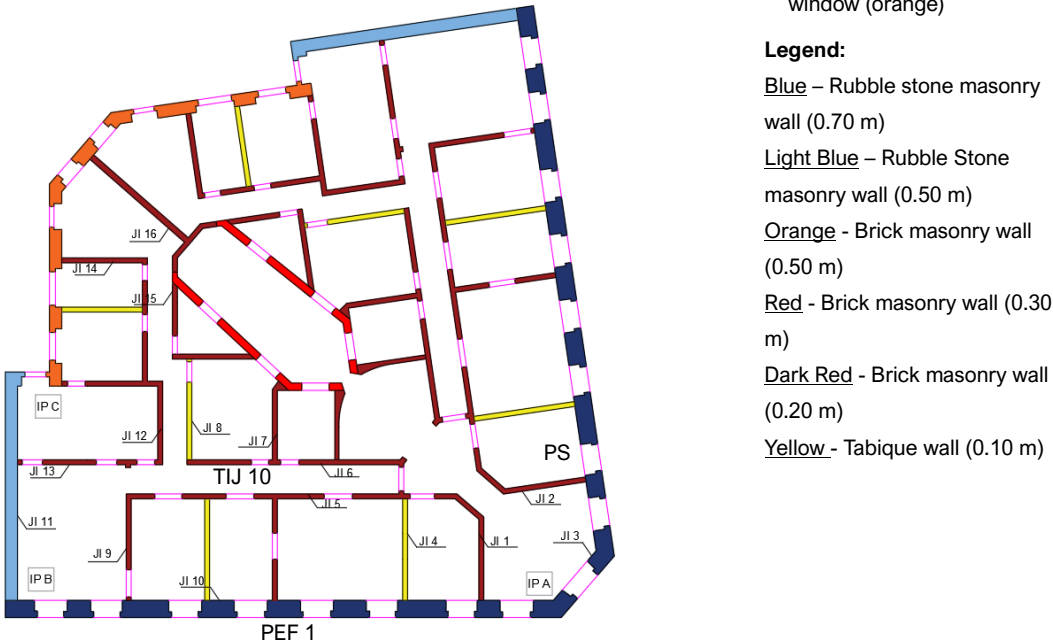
Map location of: viewing windows on walls (JI) and floor (IP) held on floor 3; probing well on r/c (PS); identification of two alignments TIJ 10 and PEF 1.
